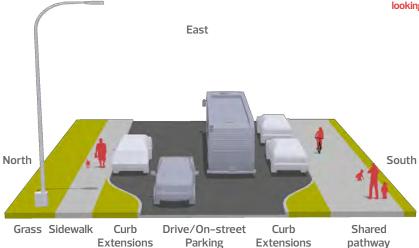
157 Avenue - Castle Downs Road to 121 Street - Cross section
